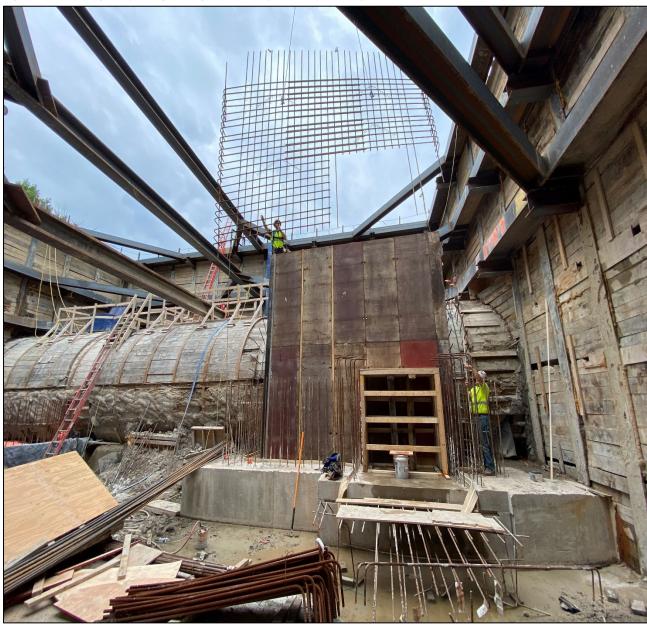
Installing Reinforcing Steel @ West Wall of Beaconsfield Shaft
